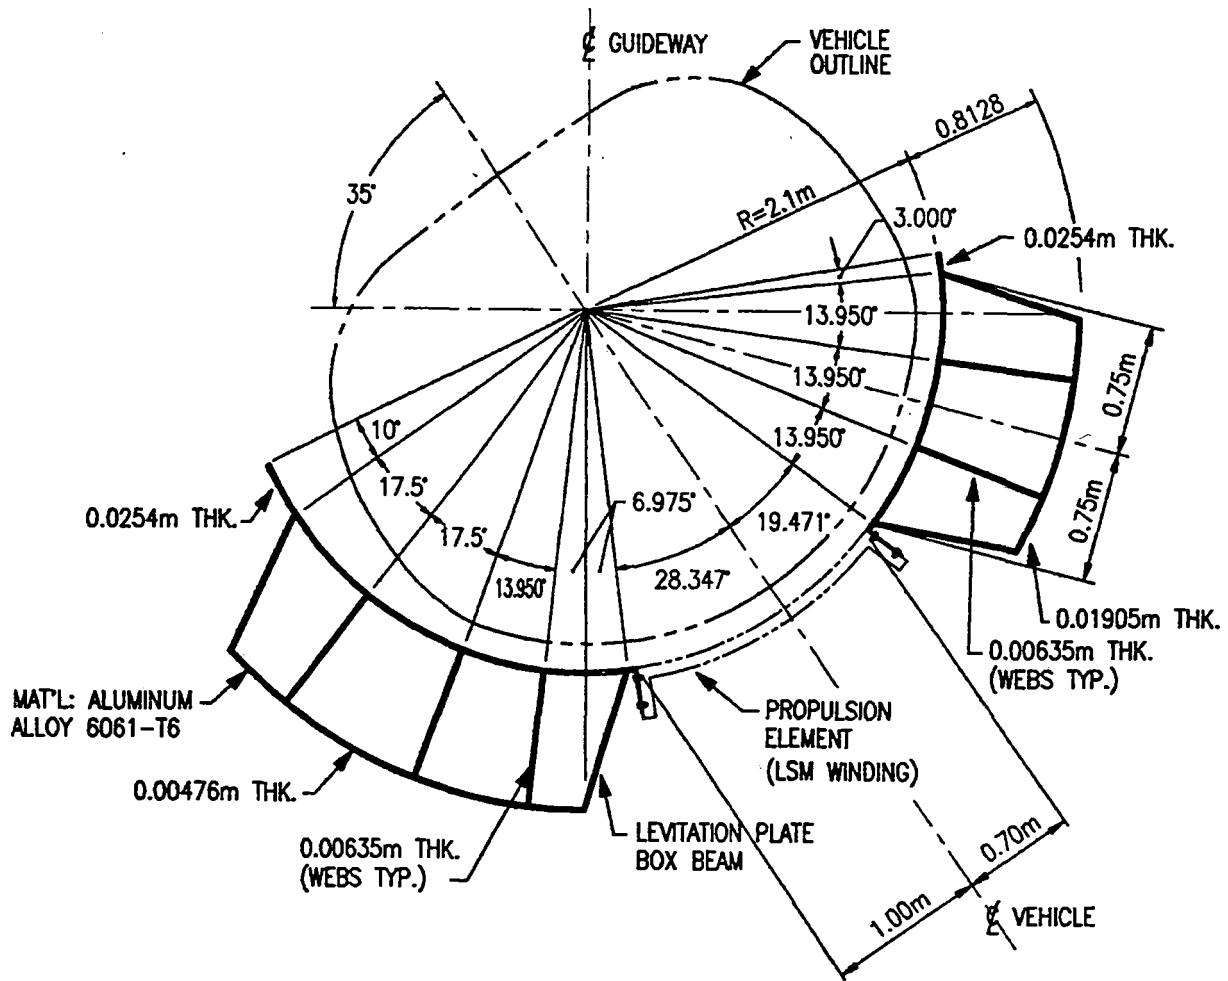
Typical banked magway section with 1.7 m wide LSM (1.0 m semi-gap on lower side)
